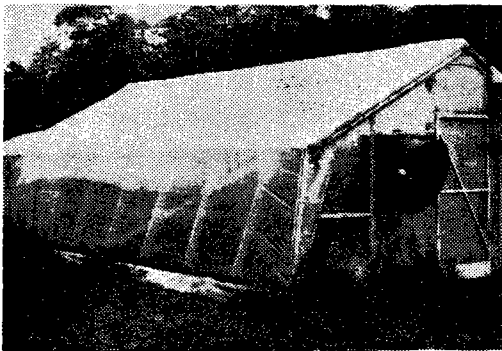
17' x 32' Typical slant-leg rigid frame greenhouse
